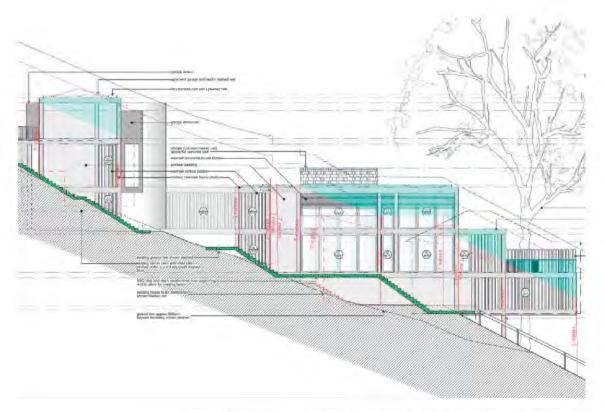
Northern elevation - Extent of building envelope non-compliance
